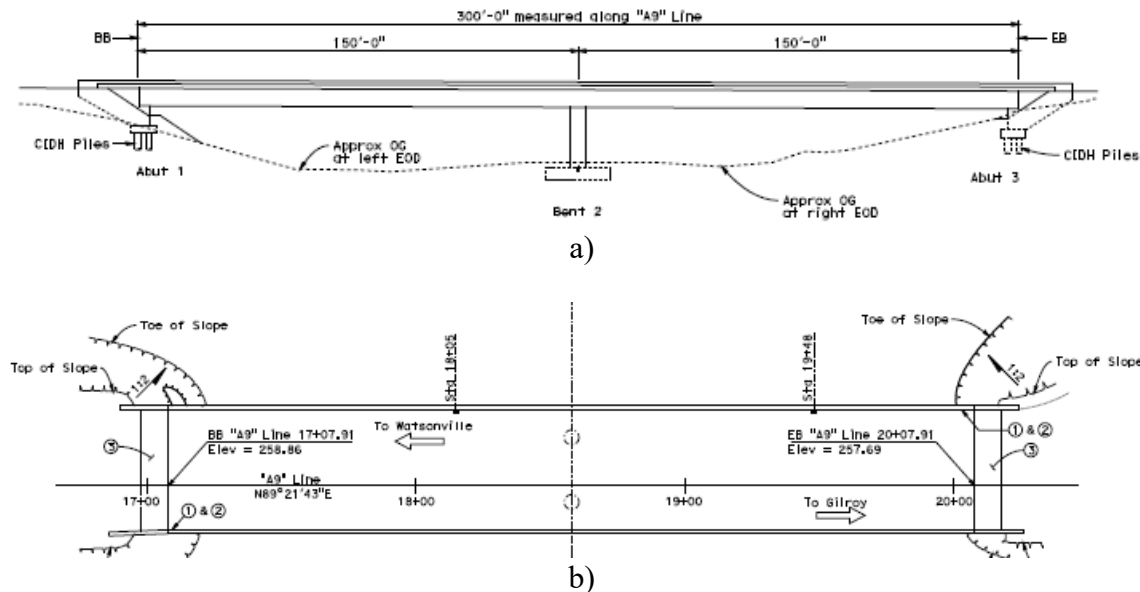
Schematic of OSB1 (drawings provided by Caltrans): (a) Elevation view; (b) Plan view
